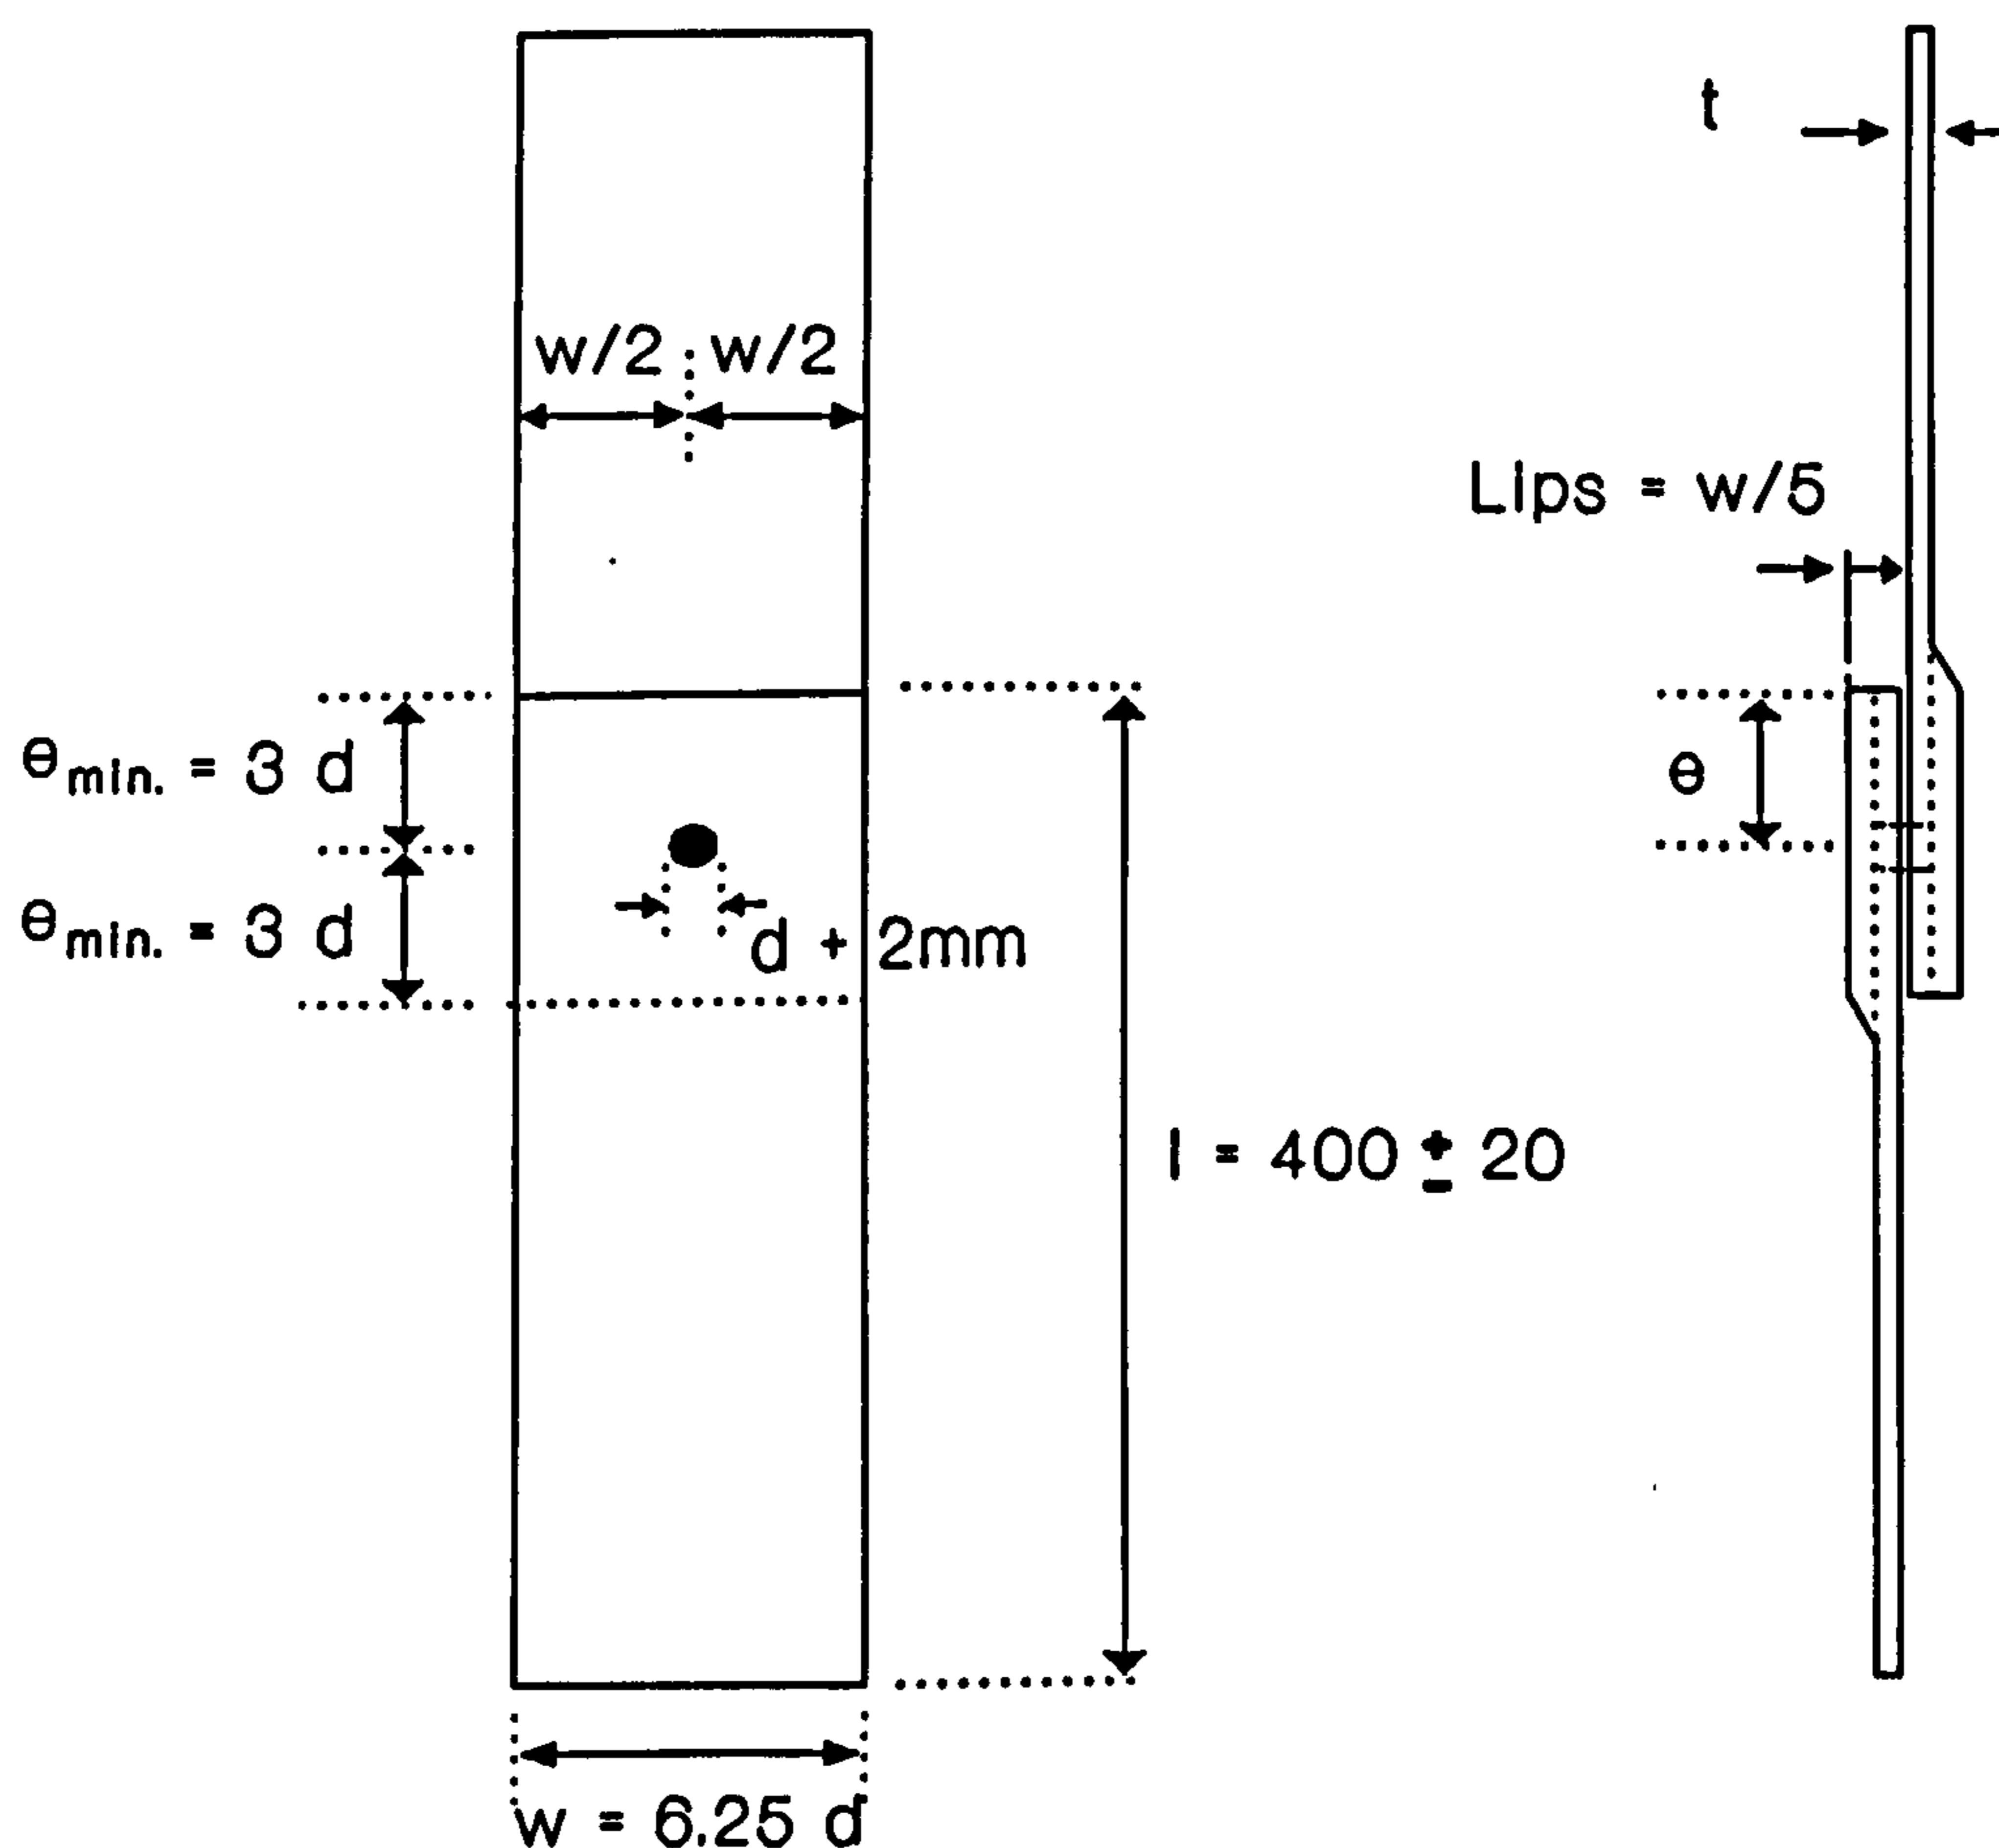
Recommended test dimensions for structural bolts in cold formed steel sections. ($d \geq 12$ mm)
